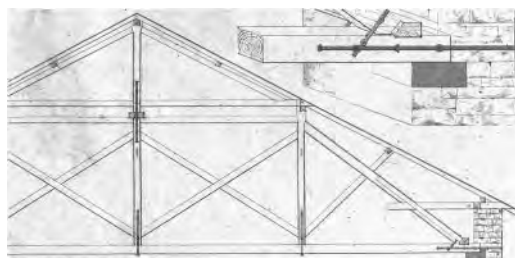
Construction plan for the riding hall in Darmstadt (Moller & Heger 1825: plate VIII).
